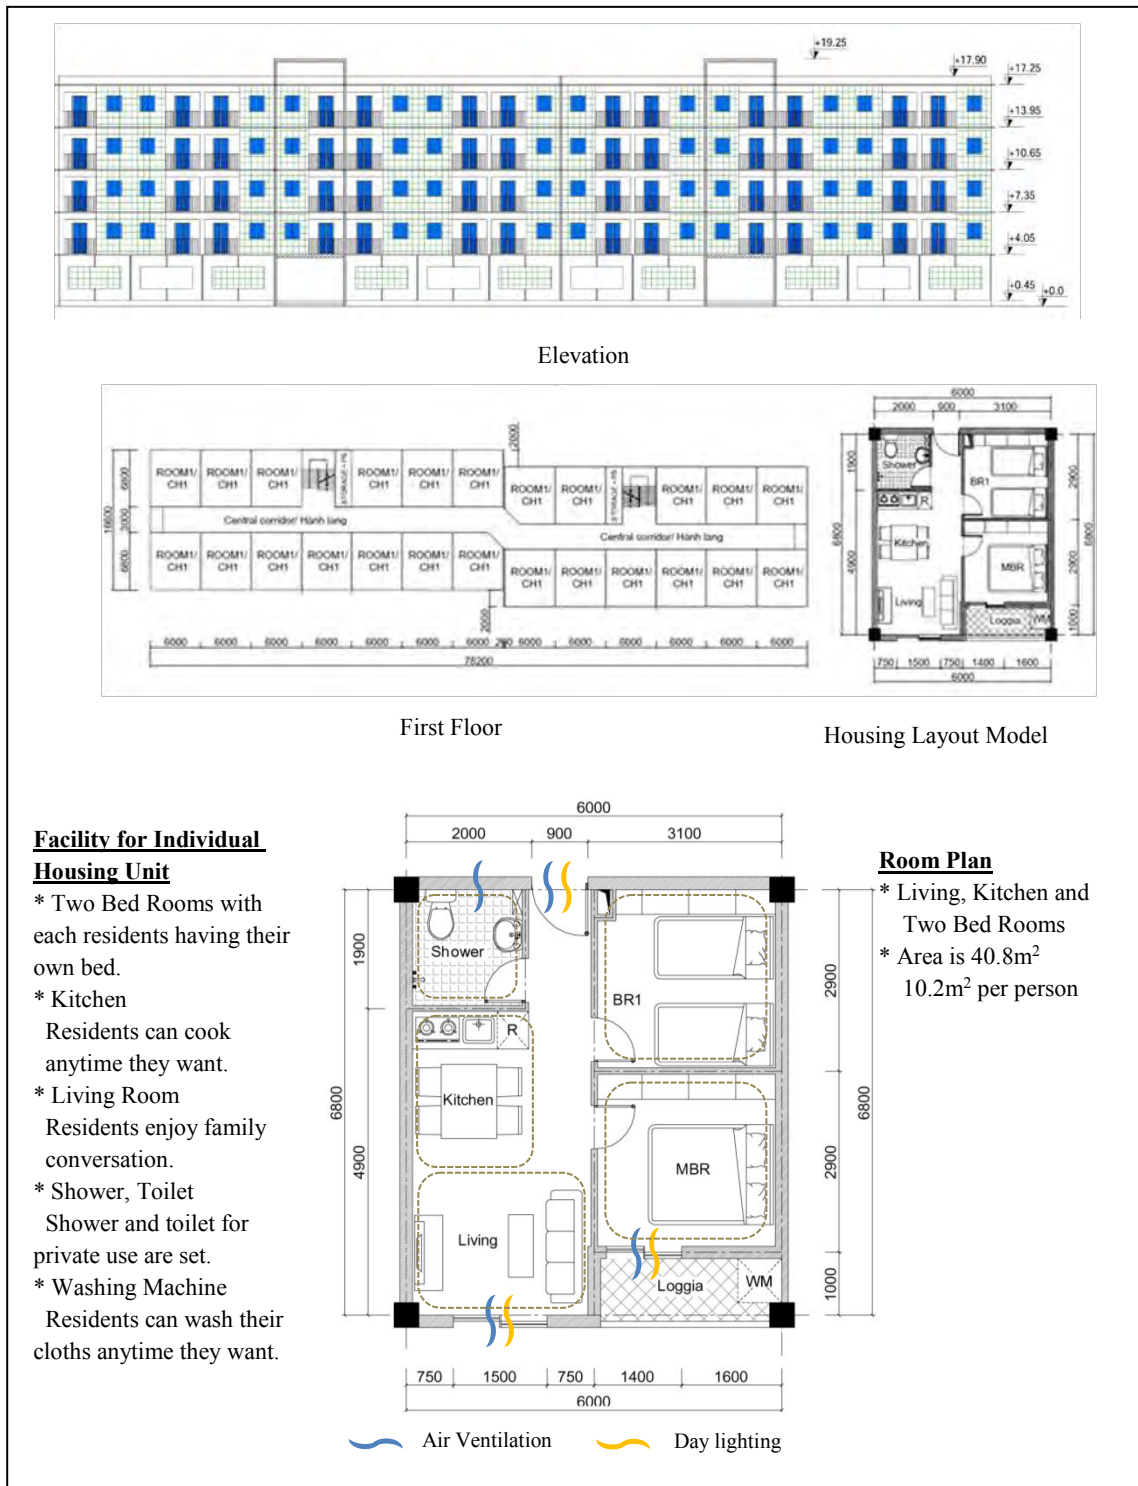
Room Plan for Single (Low -Rise Housing)
